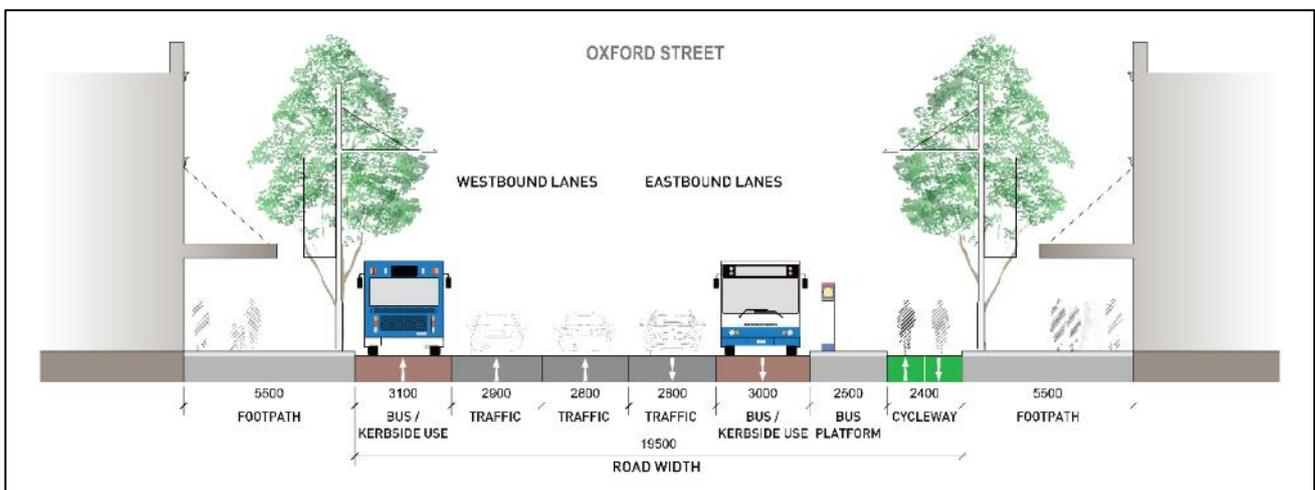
Oxford Street typical proposed road width at bus floating bus stops
